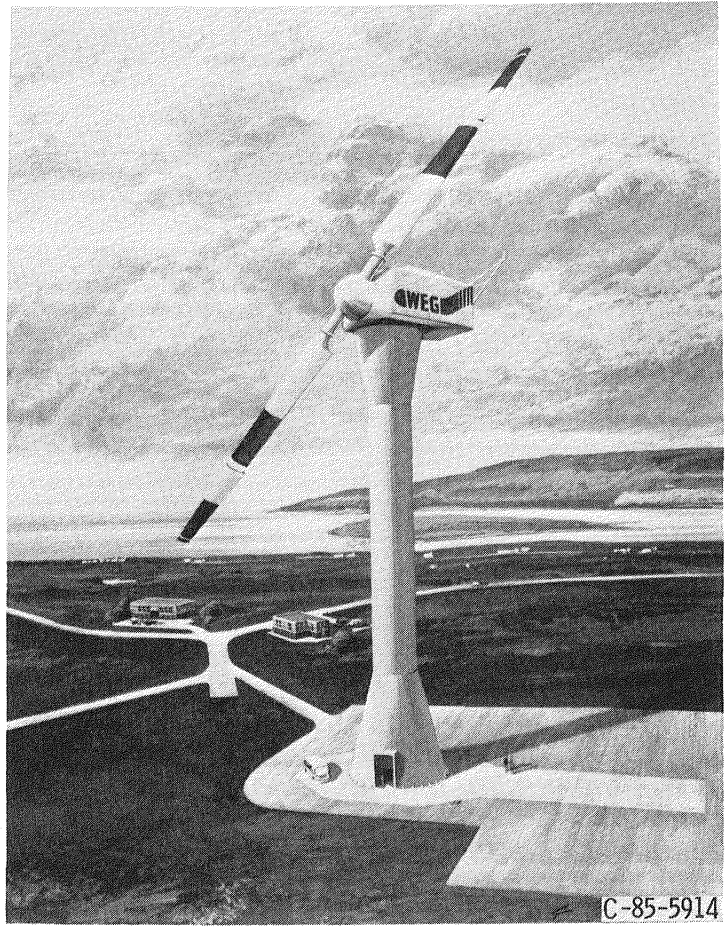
Orkney-60, 3 megawatt wind turbine. Tower is constructed of reinforced concrete cylinder and conic base, and inverted rolled steel conic section.
